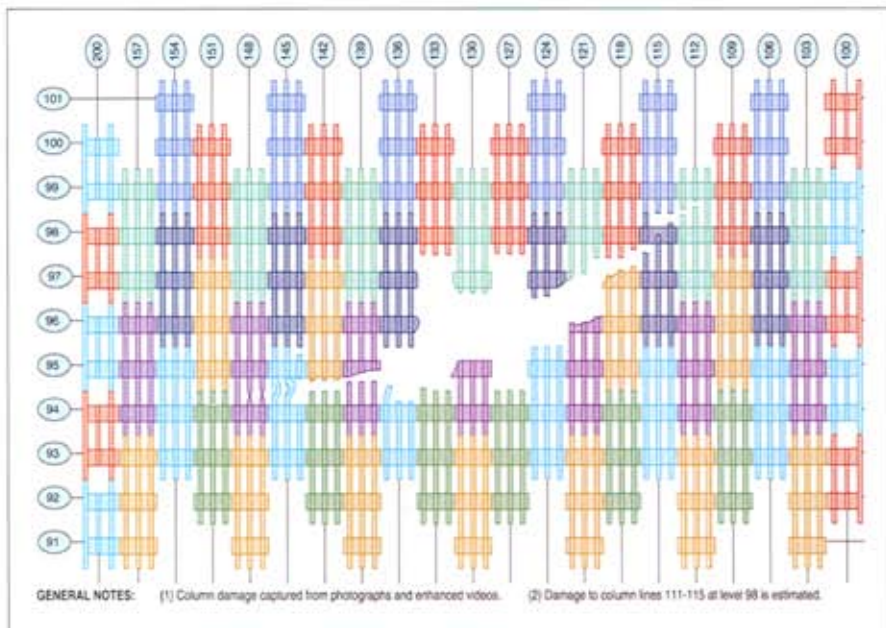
Impact damage to exterior columns on the north face of WTC 1.
